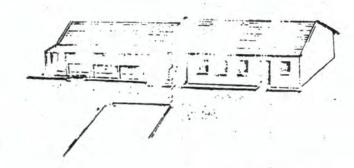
PW cellblock buildings 5A and 5B and building foundation 6.
